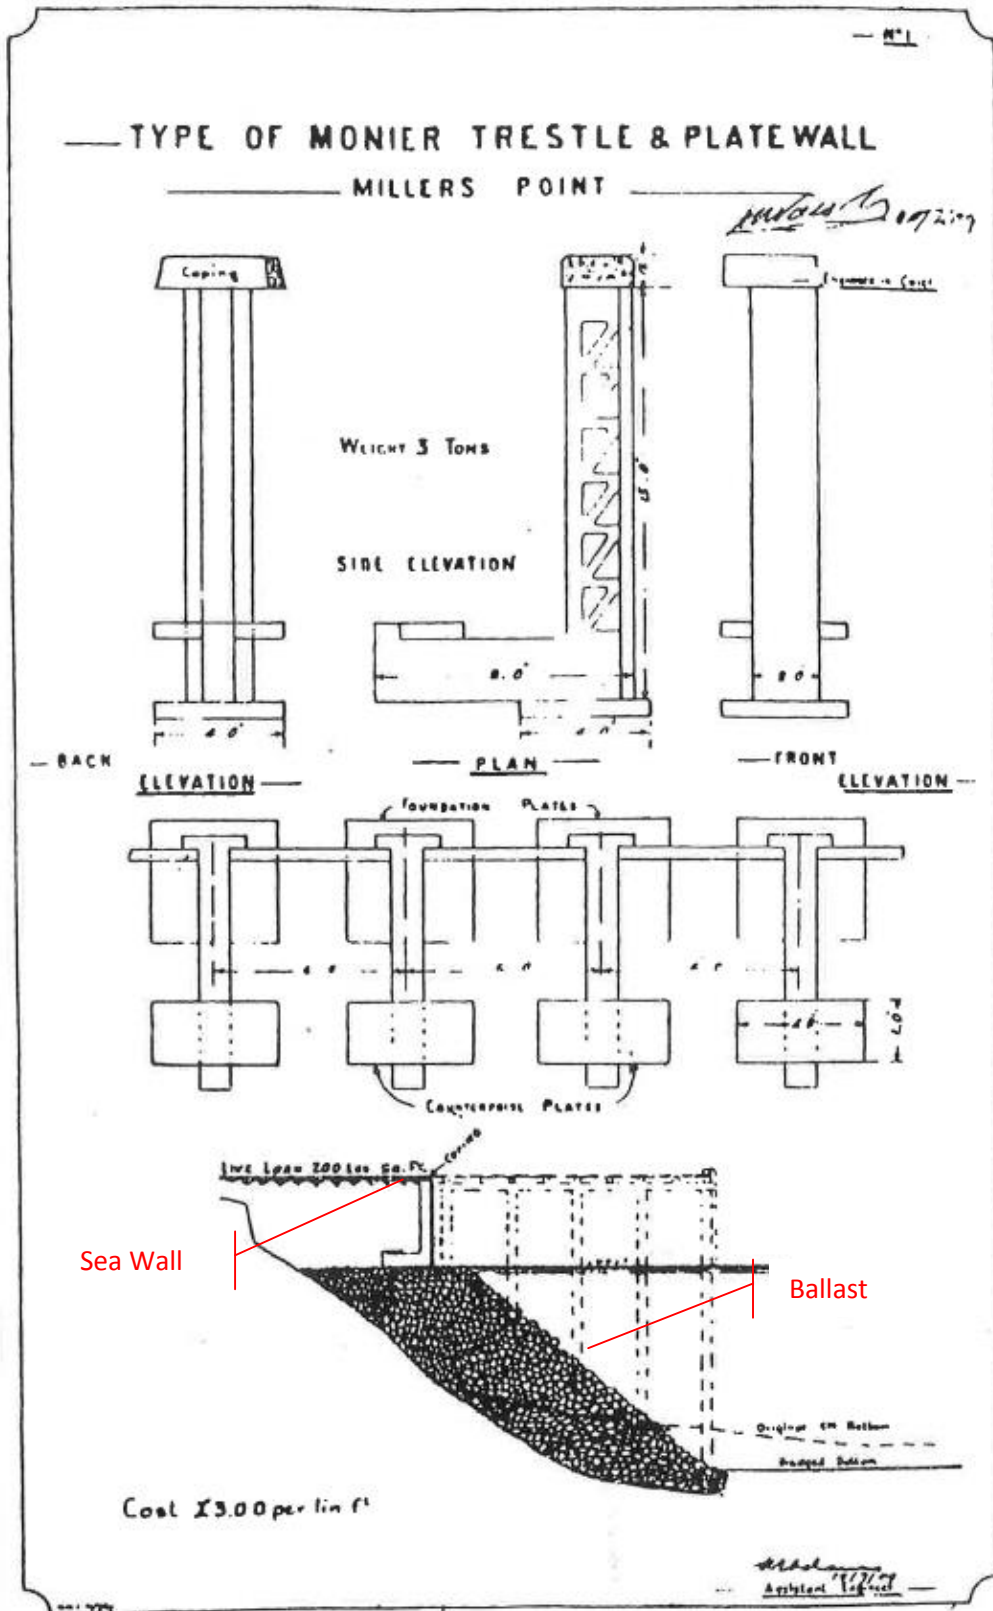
Section showing 'Rat proof' Monier pre-cast Concrete Sea Wall and the ballast, from Walsh Bay Wharf Structure, by ARUP.
